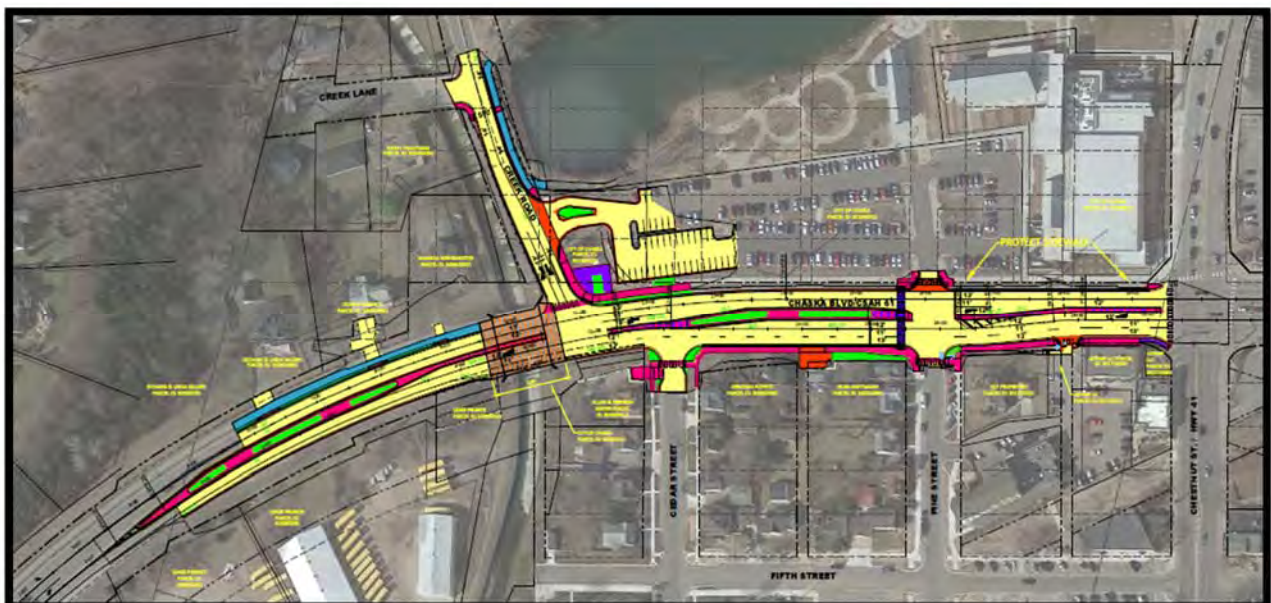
Recommended Layout for CSAH 61 West of TH 41. This was constructed in 2017.
